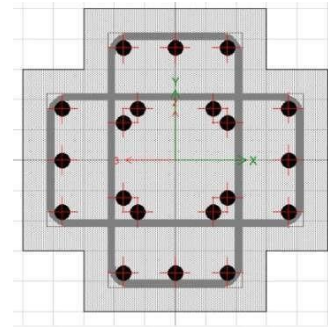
(b). Plus-shaped column, showing the doubly symmetric reinforcement arrangement.
